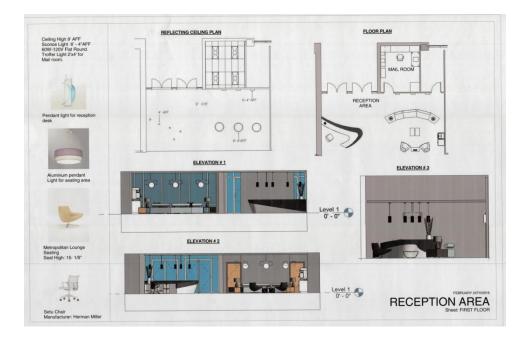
Example of Two Dimensional Drawing, Drawing Scan, March 2016. (Student Work – Unidentified)
